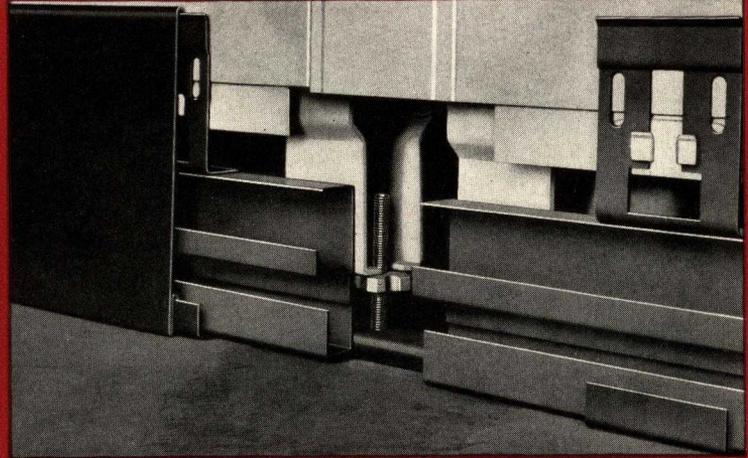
Standard Assembly at a Pilaster with High and Low Tension Conduit.
